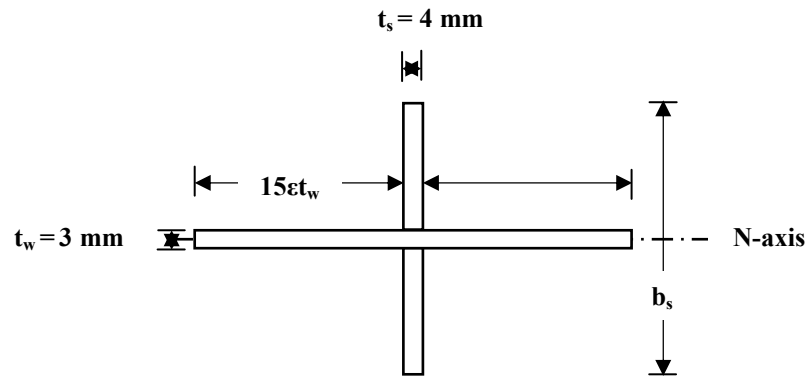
Required cross-section of intermediate steel stiffener for specimen B2
